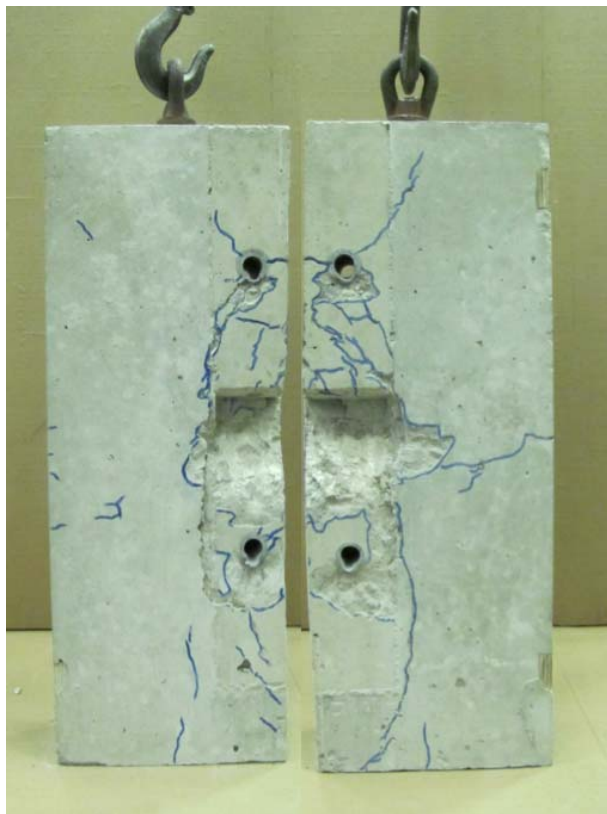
One slab of a failed push test specimen with a shear lug and bolted connection.
